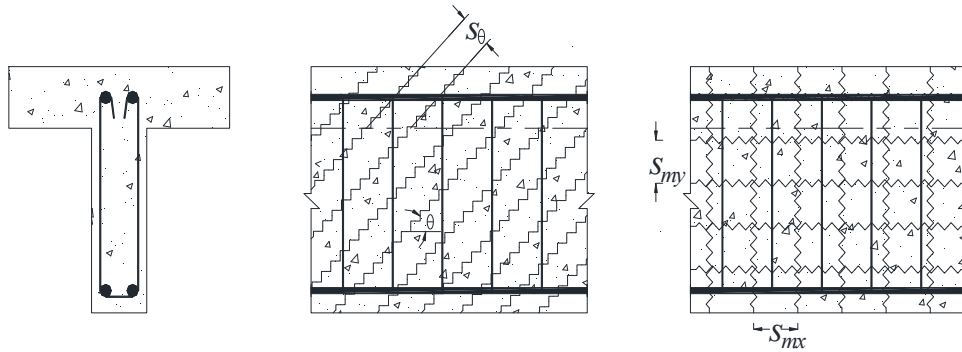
Crack spacing in reinforced concrete (Duthinh and Carino 1996)
